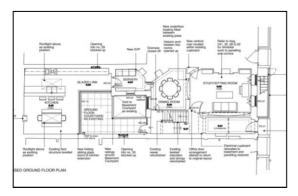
Proposed ground floor plan of the permitted infill extension at no.30 Great James Stree.
